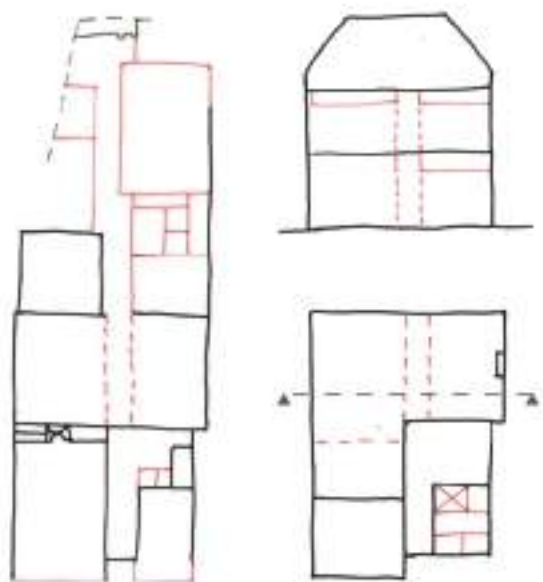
Changes made in the floorplan of the ground floor, first floor and section 1:400
